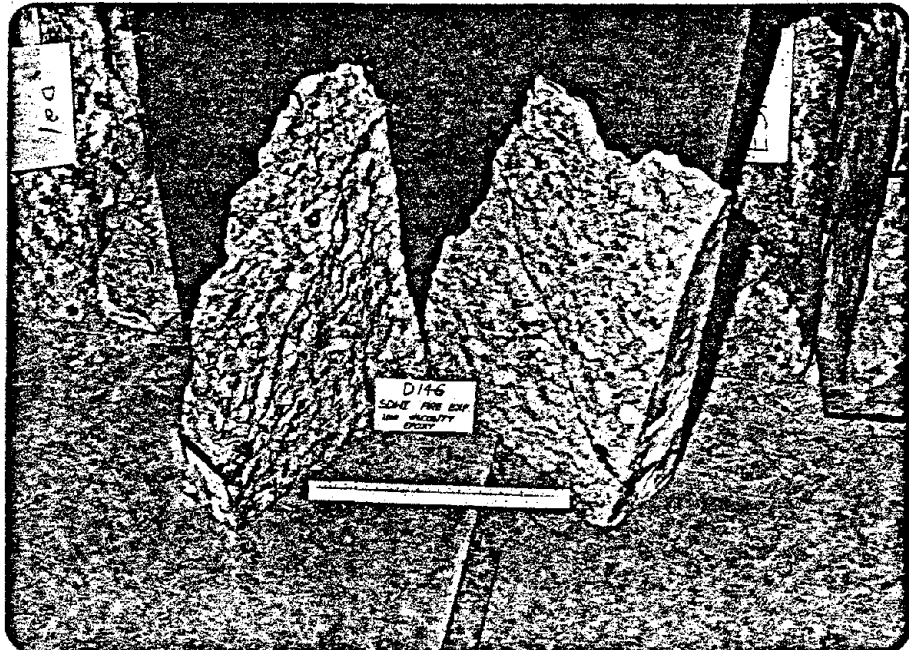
Failure pattern for 6 in. Thick Specimen. Note the Shear failure through the Concrete.
